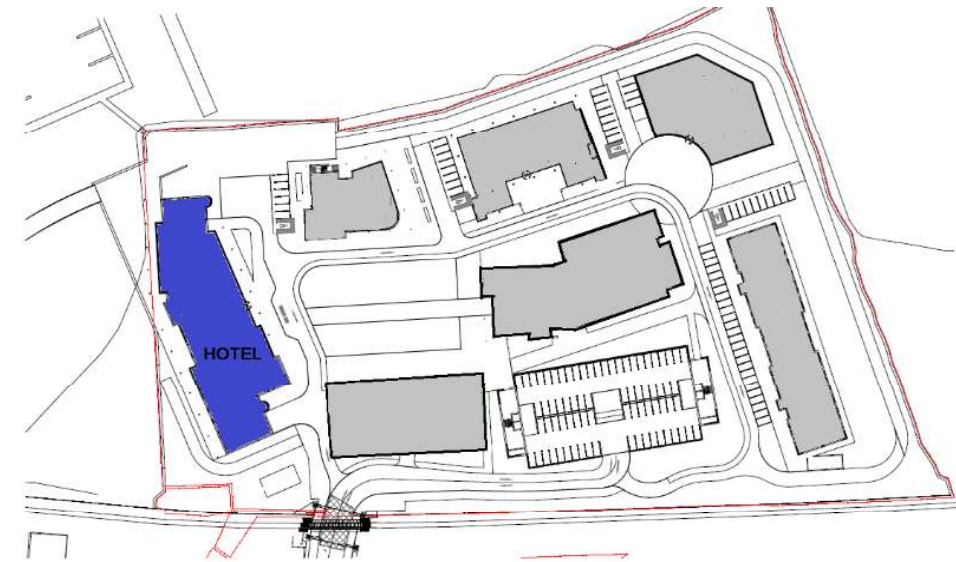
Site Key Plan Indicating the Hotel Building Location
